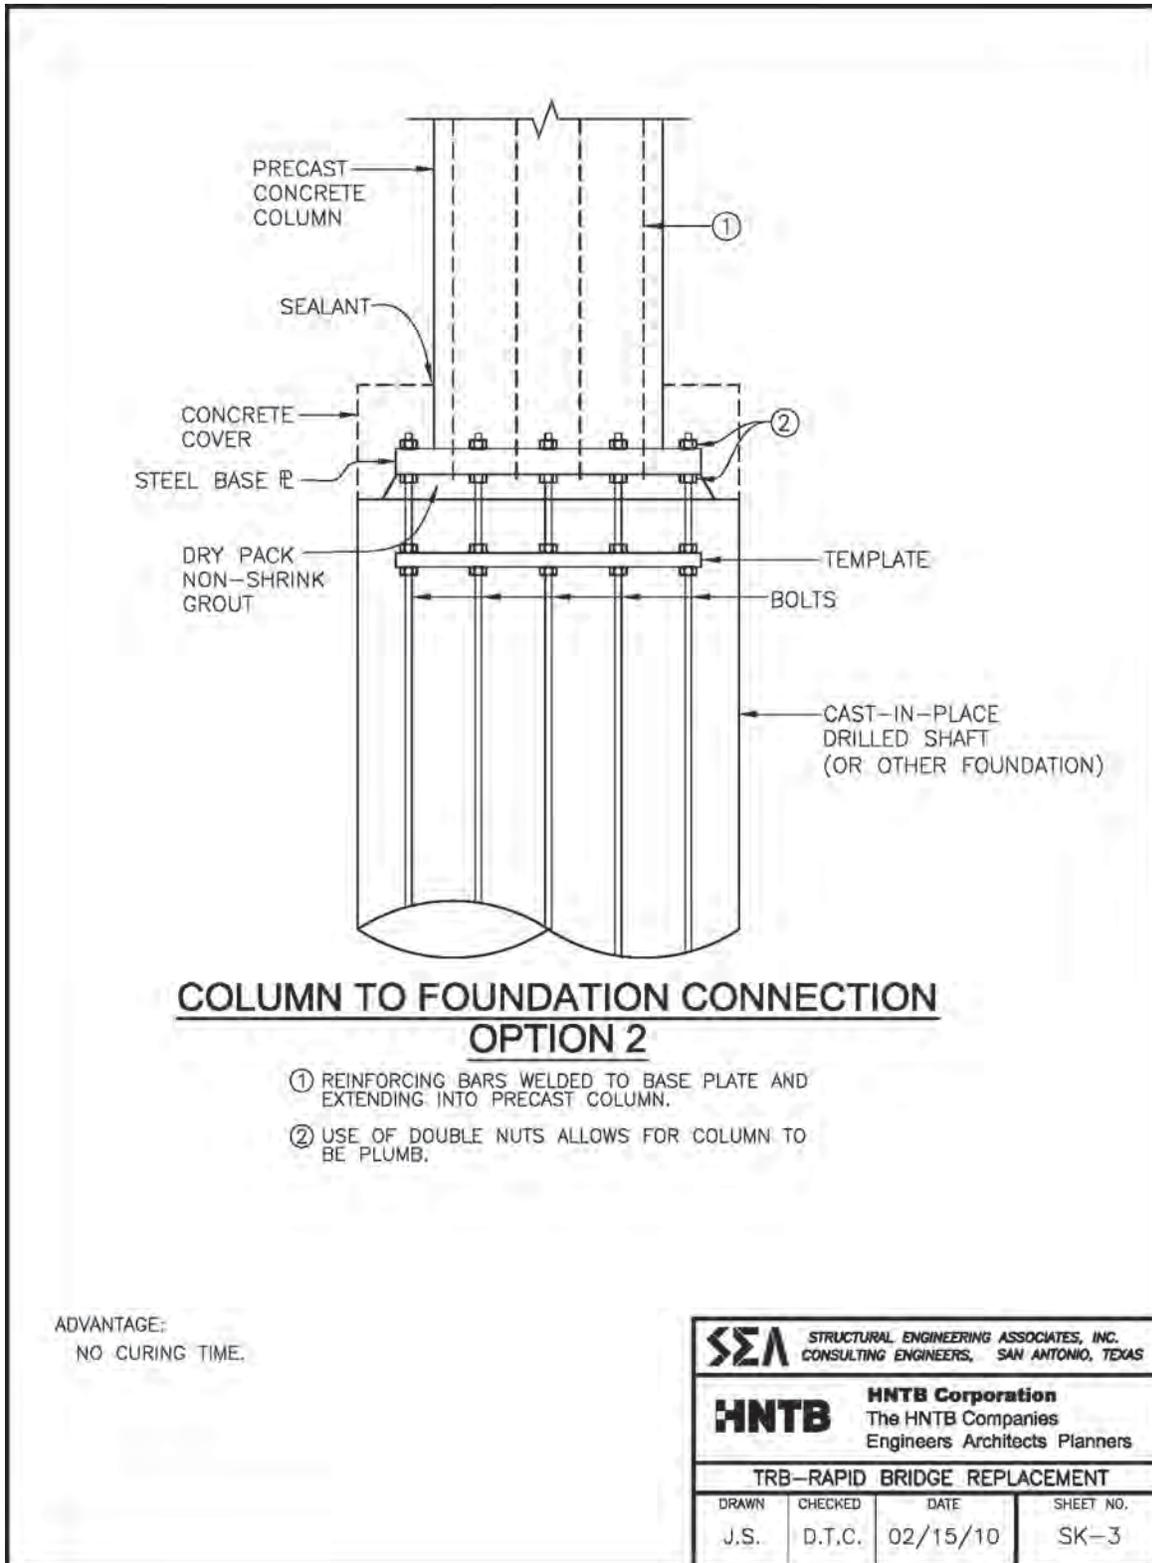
Alternate column-to-foundation connection—Option 2.
